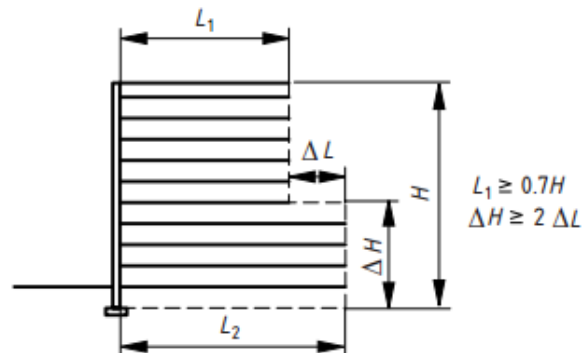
Geogrid-reinforced wall (from BS 8006, 2010).
